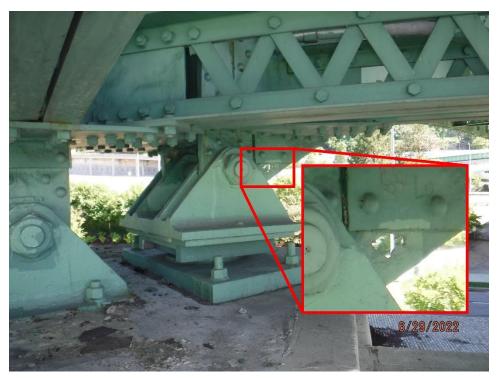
3-in diameter corrosion hole in the South Gusset Plate of L0 in Span 7 of the Center Truss
